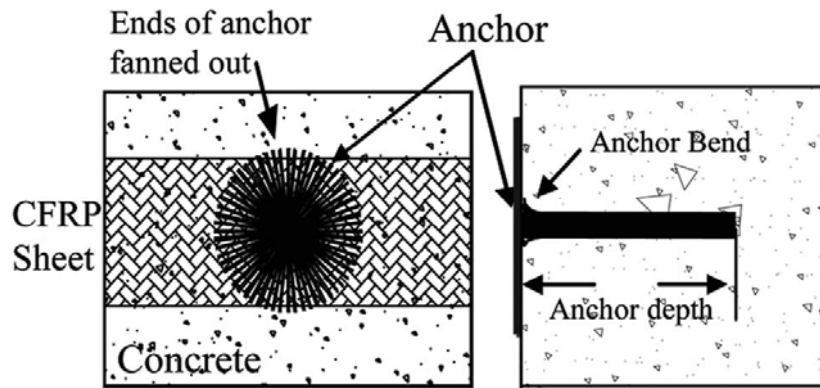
CFRP anchor with 360-degree fan [Orton et al. 2008]
